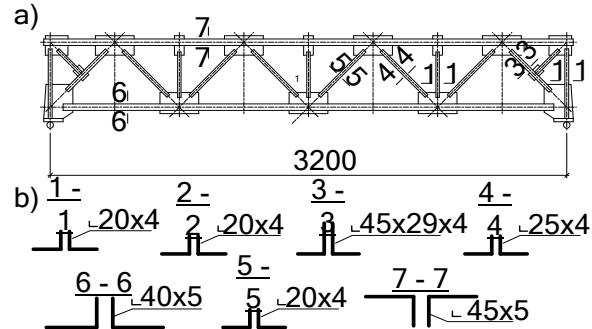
Constructive scheme of the model of a standard truss a) general view; b) cross-sections
